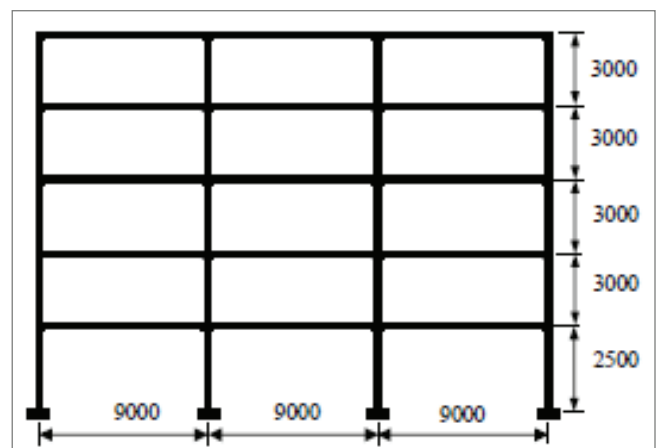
Long Span Steel-Concrete Composite MRF Frame
